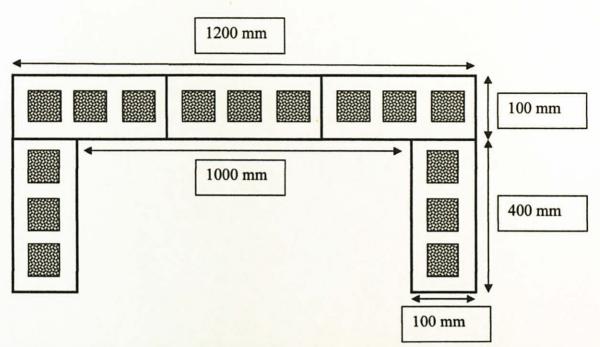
Plan view of the prototype crumb rubber noise barrier wall with crumb rubber filler and side wall
